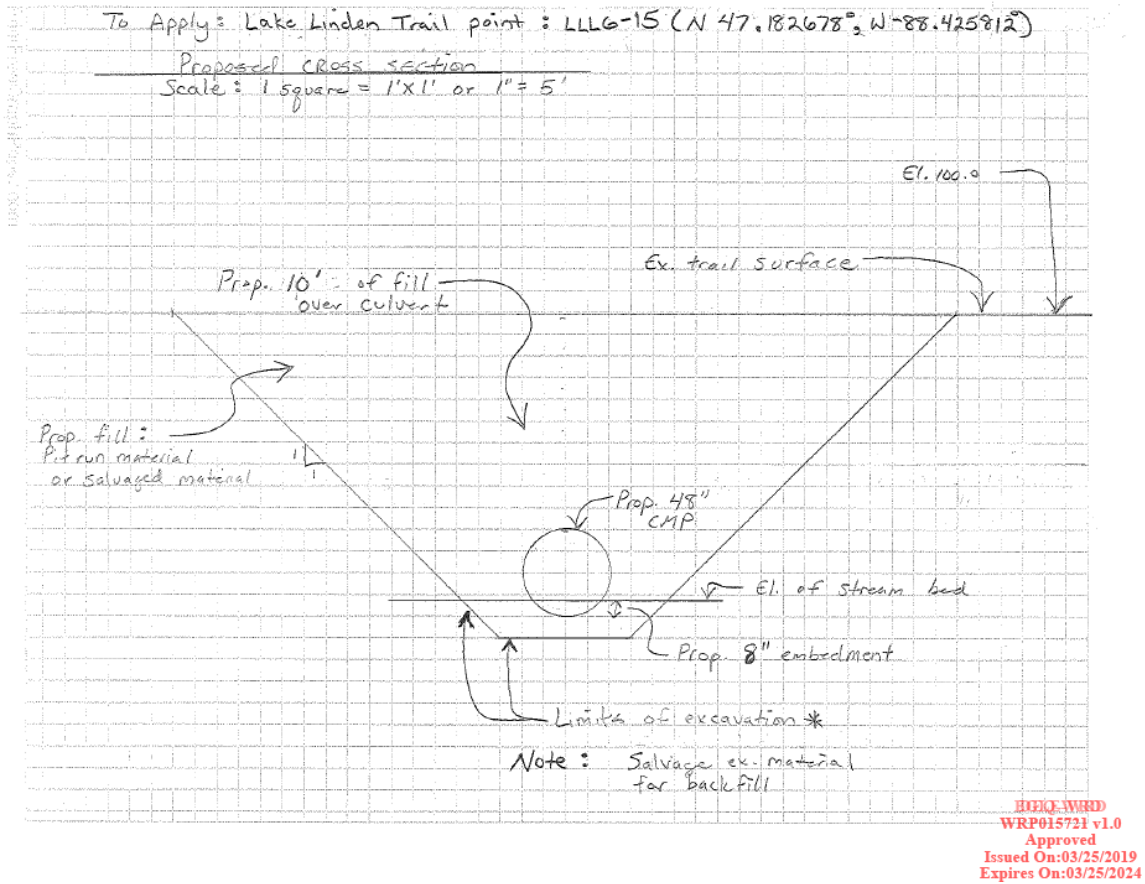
LLLG-15 Culvert Replacement Cross Section [18].
